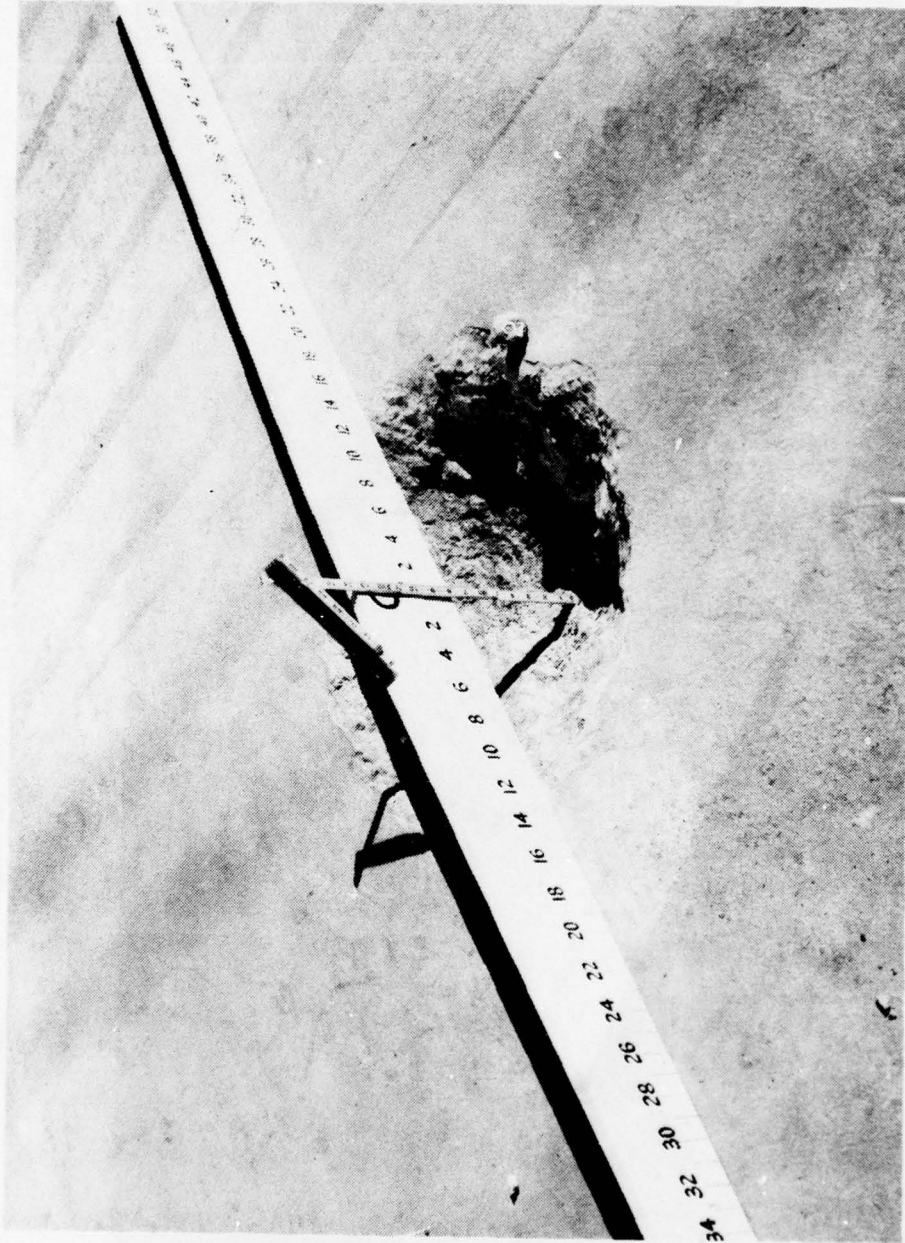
Typical 2-Foot-Diameter Area in Portland Cement Concrete Pavement
